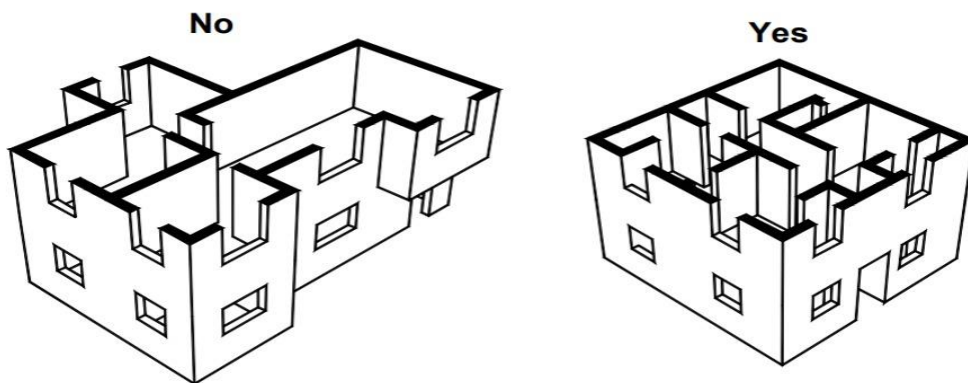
Layout of wall (*Boen et al, 2011*)
